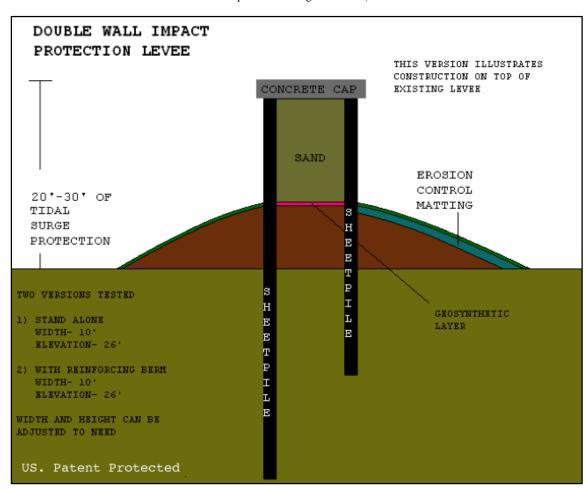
Double wall through existing levee, (adapted from Strong Levees: http://www.stronglevees.com)
